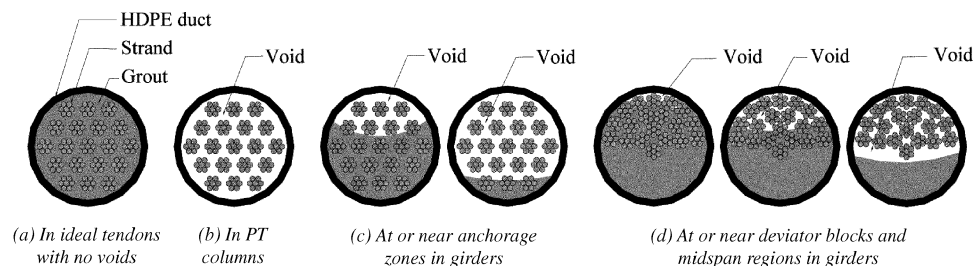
Typical cross-sectional views of grouted tendons with and without voids.
